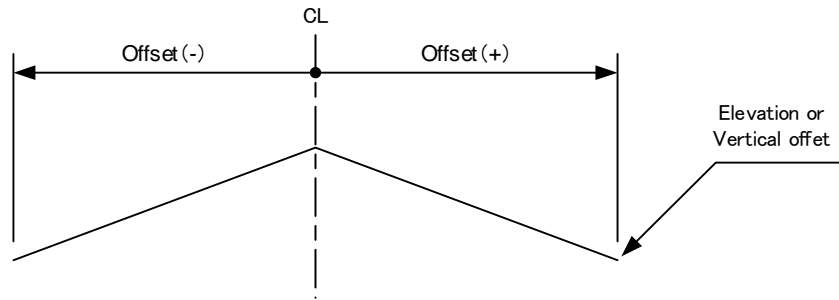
Offset and elevation or vertical offset (OffsetElevation)
